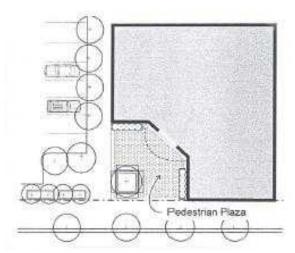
(a)-1. The orientation of this pedestrian plaza is well suited to provide a pleasant outdoor space, convenient pedestrian access, and landscaping enhancement of the building.
